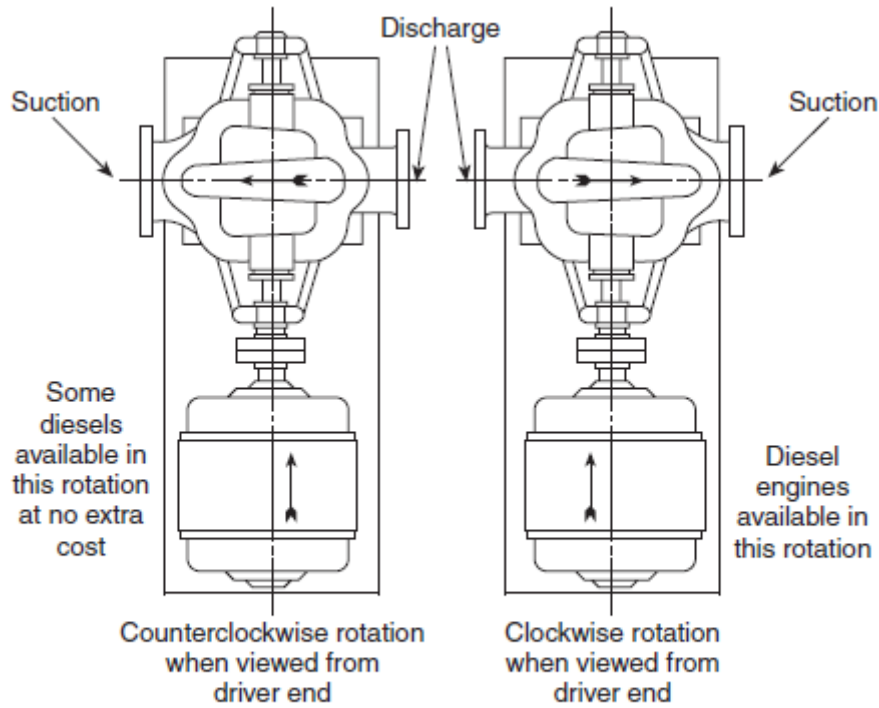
(a) Horizontal Pump Shaft Rotation.
